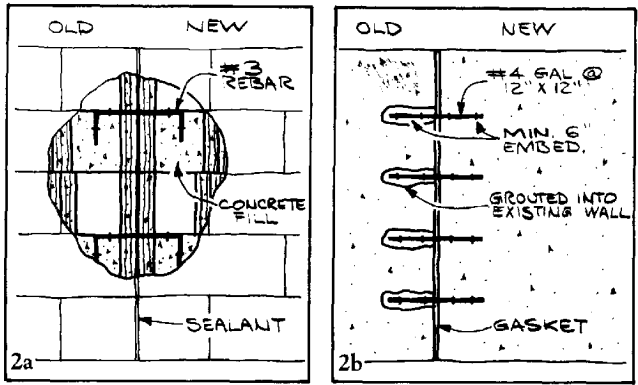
Tying in. Bent #3 bar should be grouted in place in alternate courses to join new to old block. For concrete walls, drill into the old wall, dowel, and compact with a non-shrink grout. Seal the joint with urethane or silicone (for masonry) or a compressible gasket (for concrete).
